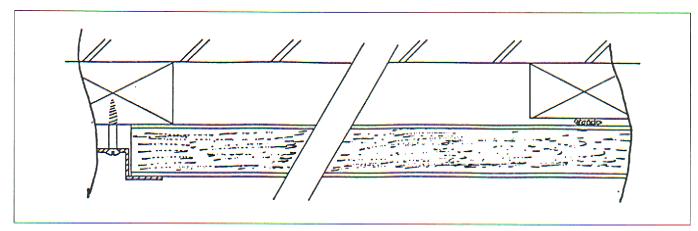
Left: Omega profile, screw-fixed to the substructure. Right: Glued to the substructure with elastic construction adhesives
